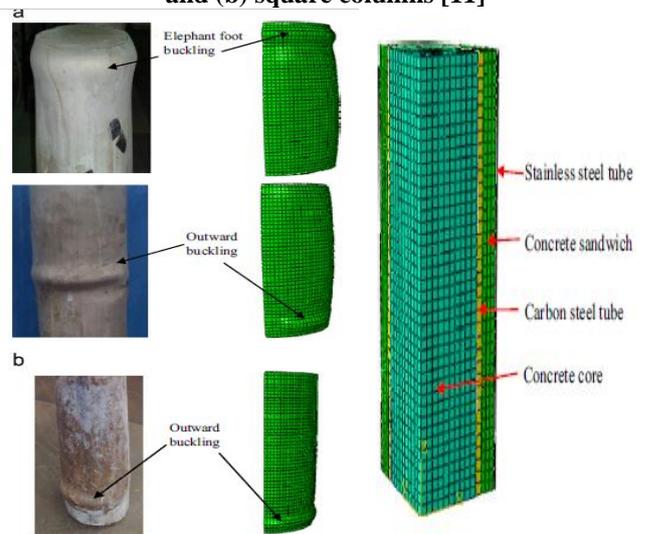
(a) Failure occurred in Stainless (b) In Carbon steel (c) Model & Element division stainless steel with concrete [8]
